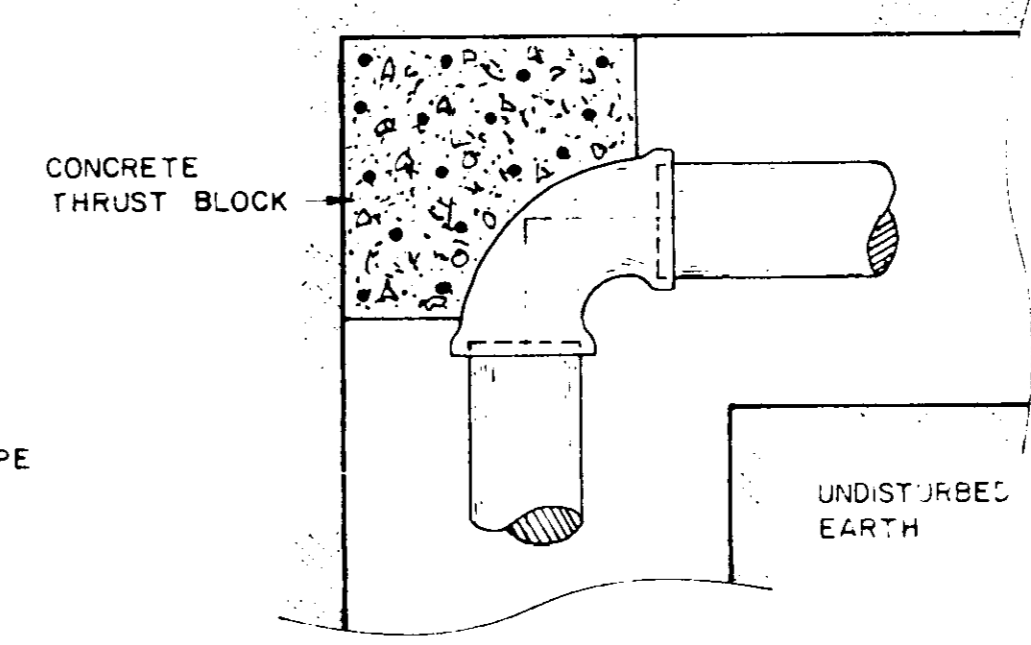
DETAILS OF CONCRETE ANCHOR FOR VERTICAL BENDS
